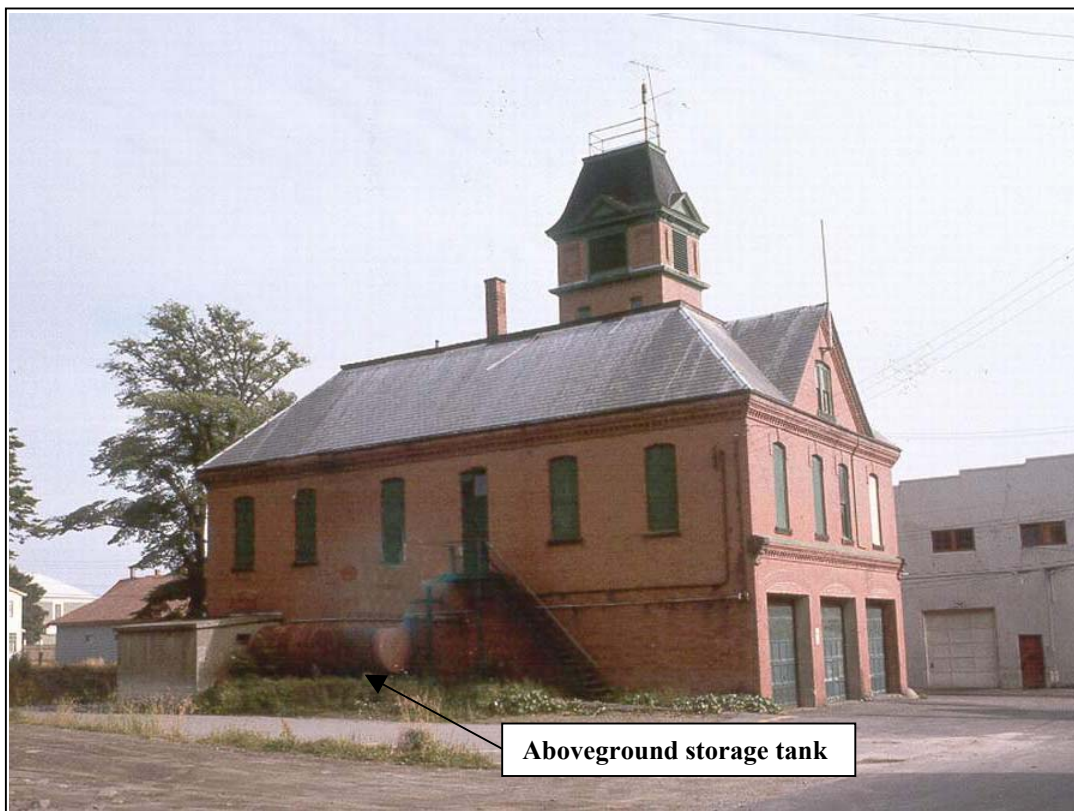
Taken 1978. Former engine house at the southwest corner of the subject property. Note the steel aboveground storage tank on the north side of the building. The engine house was demolished in 1978. Photo taken facing southeast.
